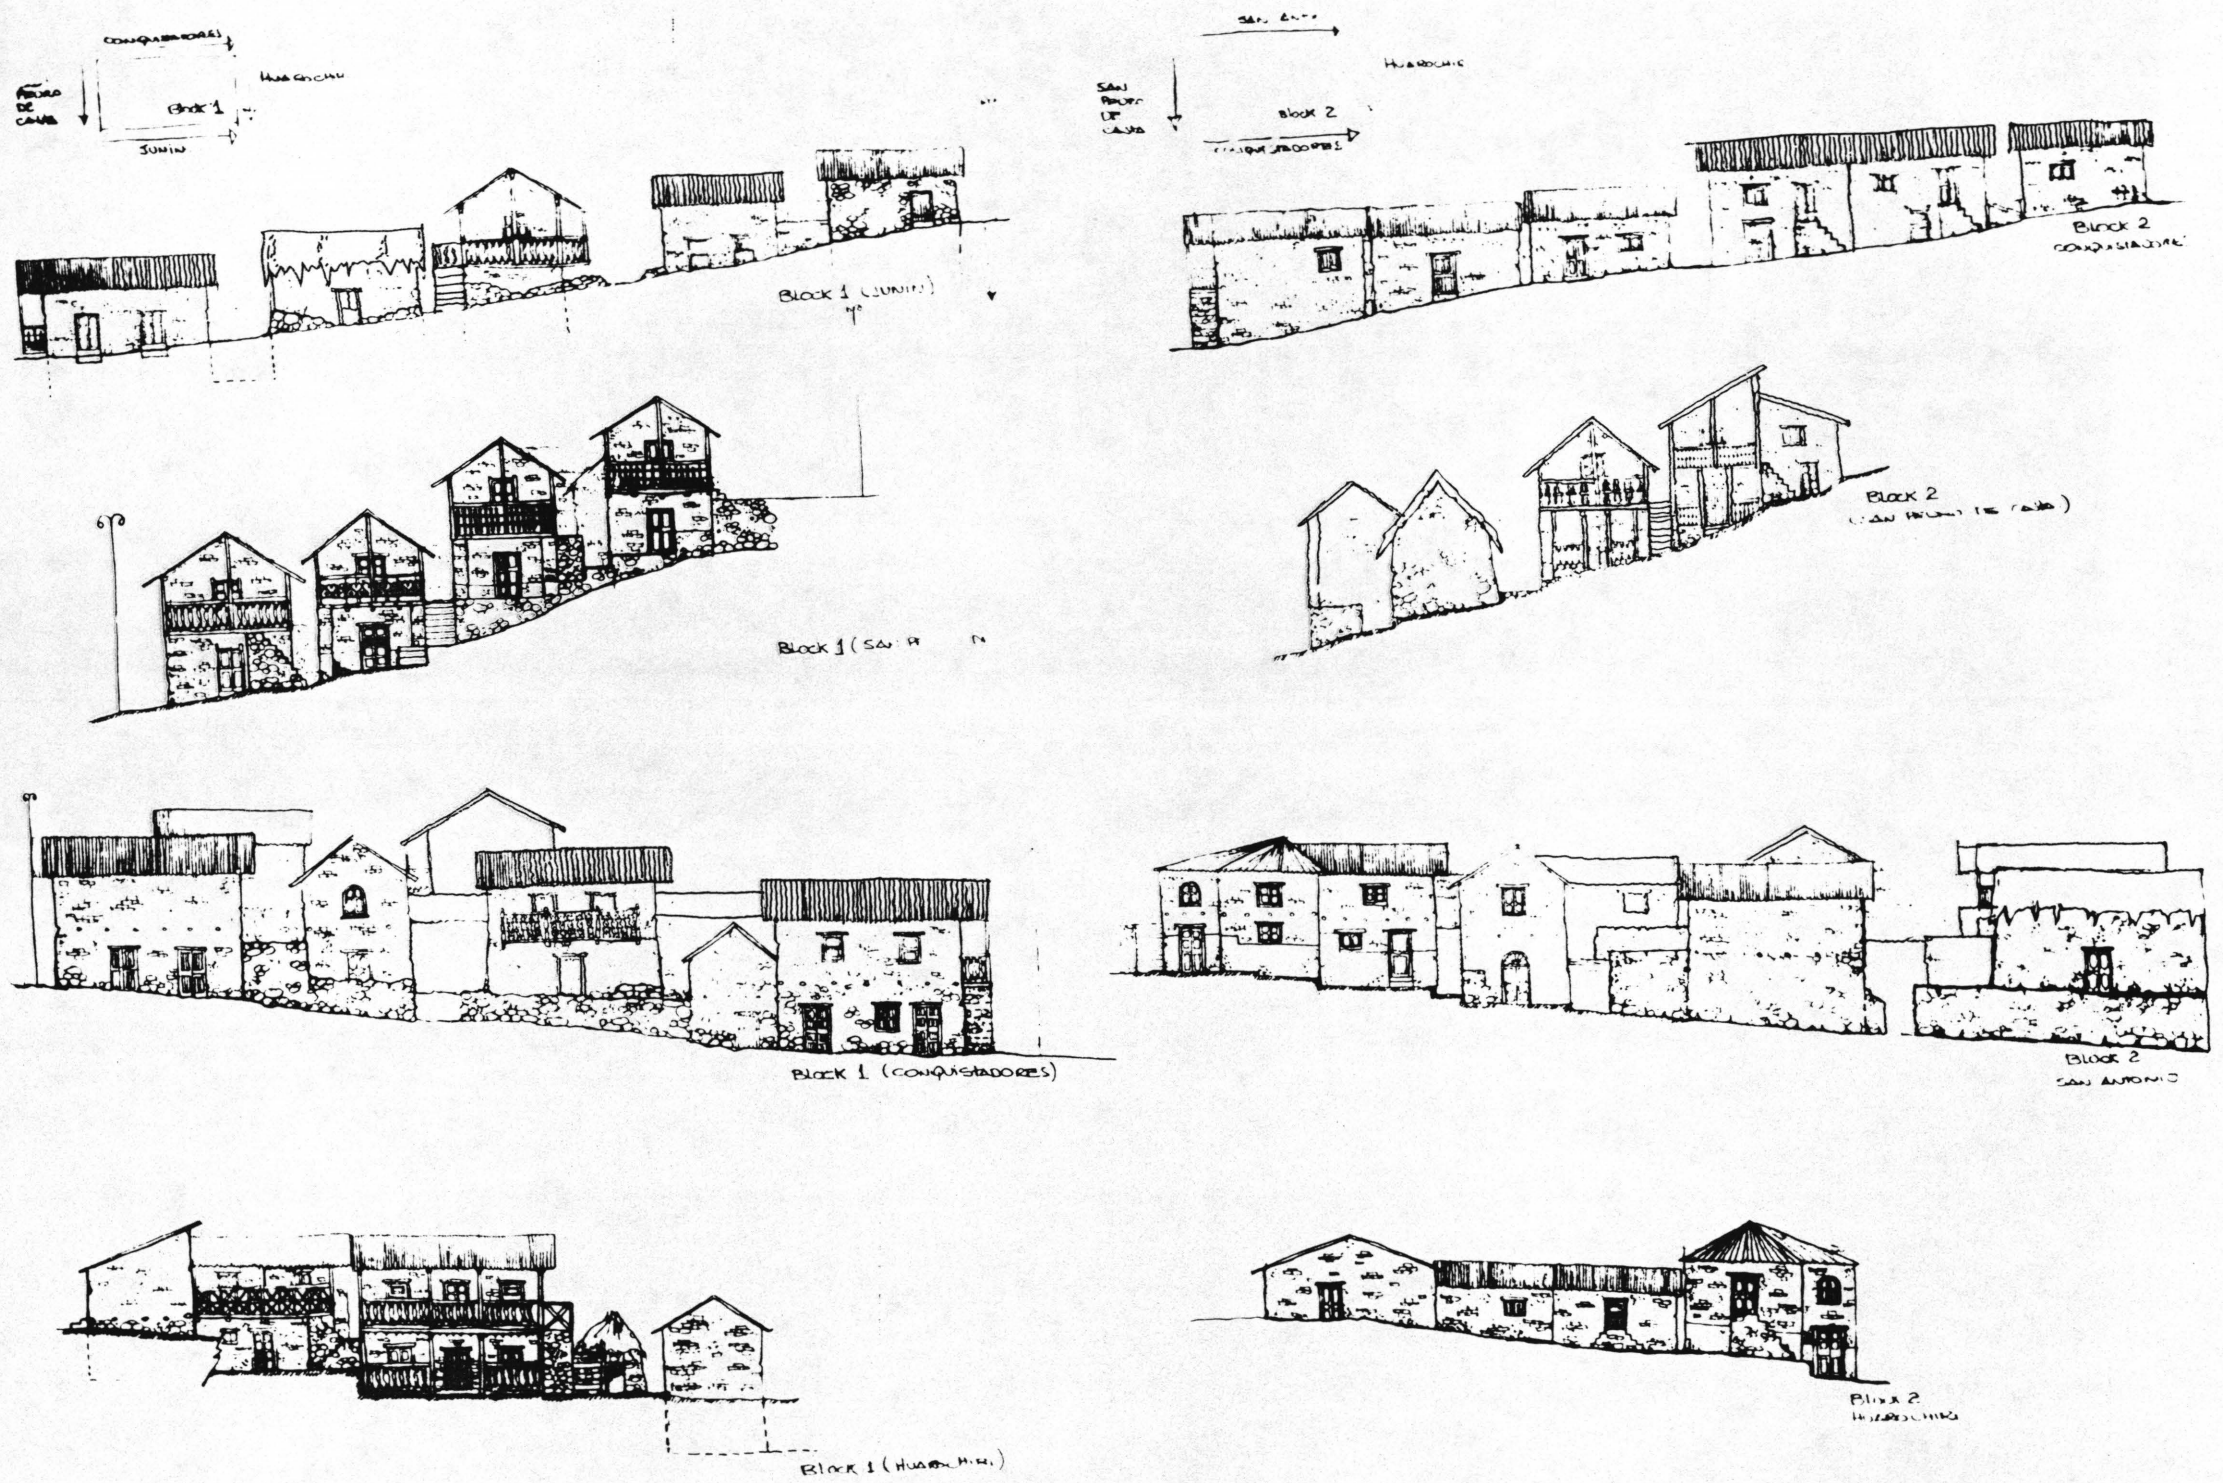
The Spatial Structure Elevations of Blocks No1 and No2
